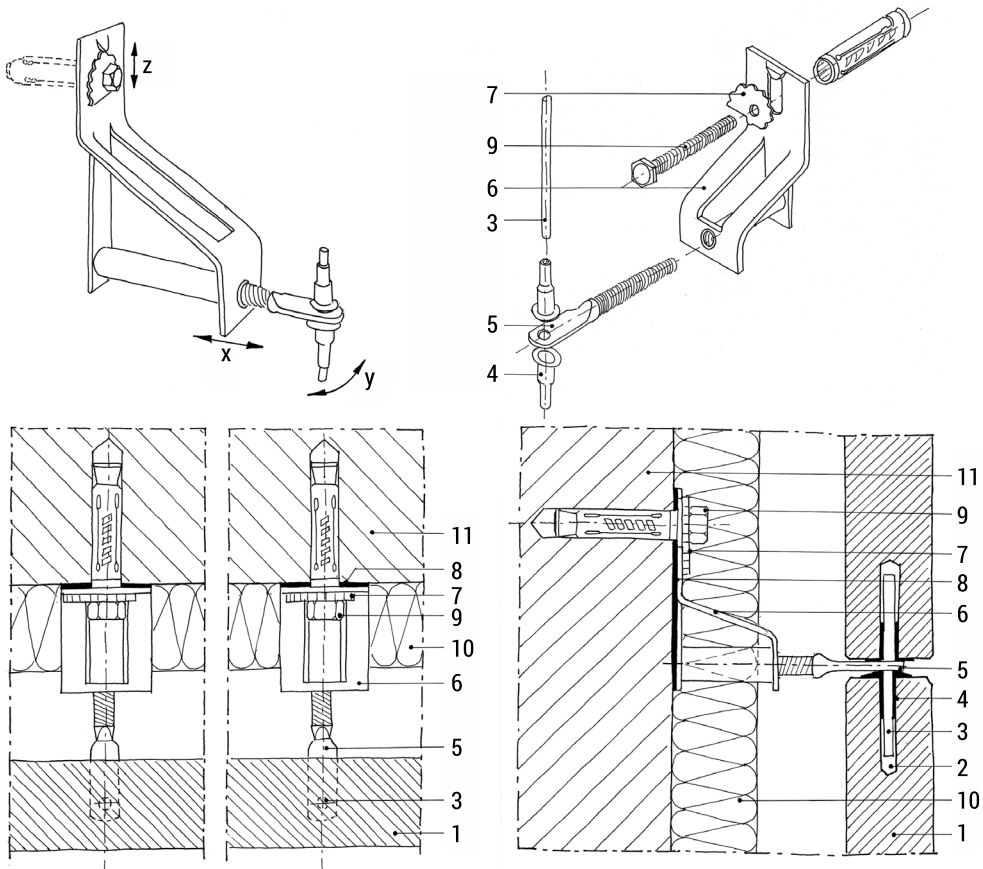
Point fixing system with pegs in holes in the cladding edge. Caption: 1. Cladding; 2. Peg accommodation; 3. Peg; 4. Nylon tube; 5. Adjustment screw; 6. Fixing bracket; 7. Adjustment washer; 8. Bracket thermal break; 9. Expansion anchor; 10. Insulation panel; 11. Load bearing layer (Source: own elaboration)
